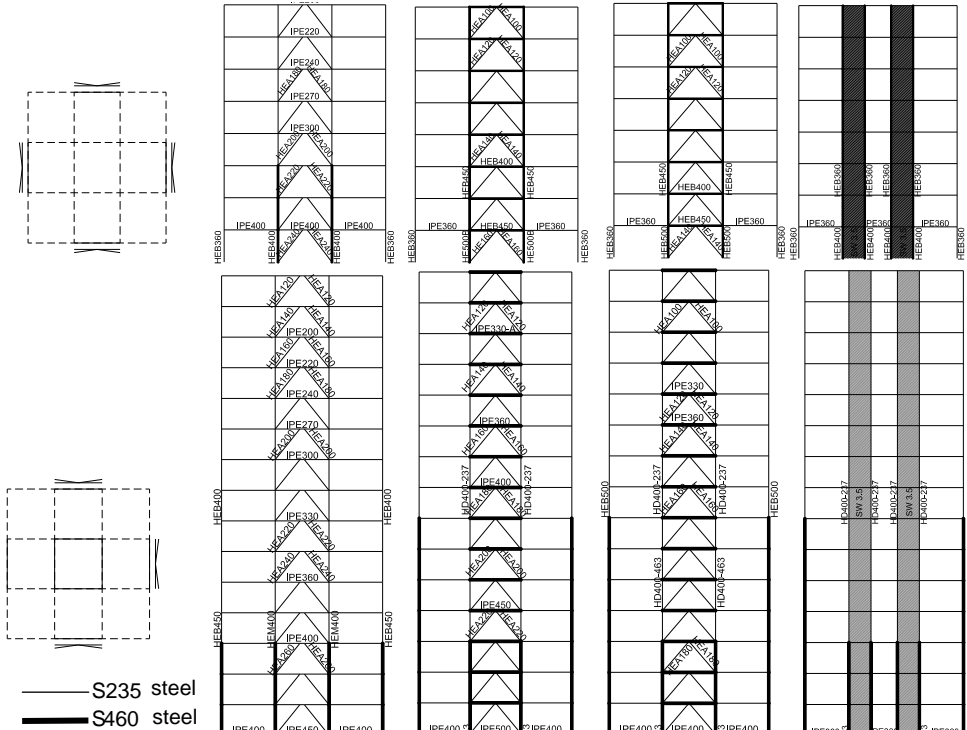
Frame systems: (a) plan view and elevation of EBF8, CBF8, BRB8 and SW8 structures; (b) plan view and elevation of EBF16, CBF16, BRB16 and SW16 structures
